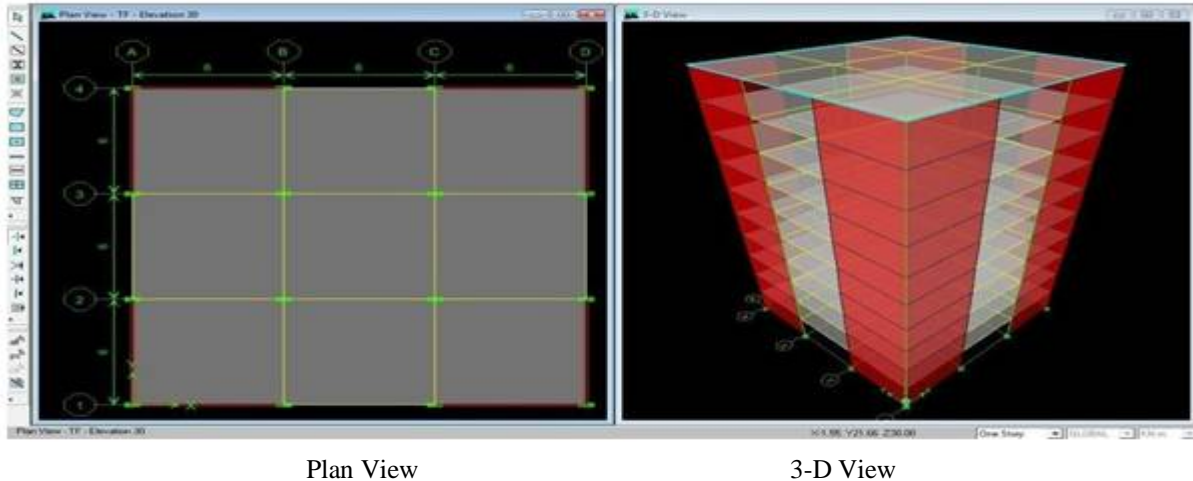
showing G + 9 Storey Building with Shear wall
